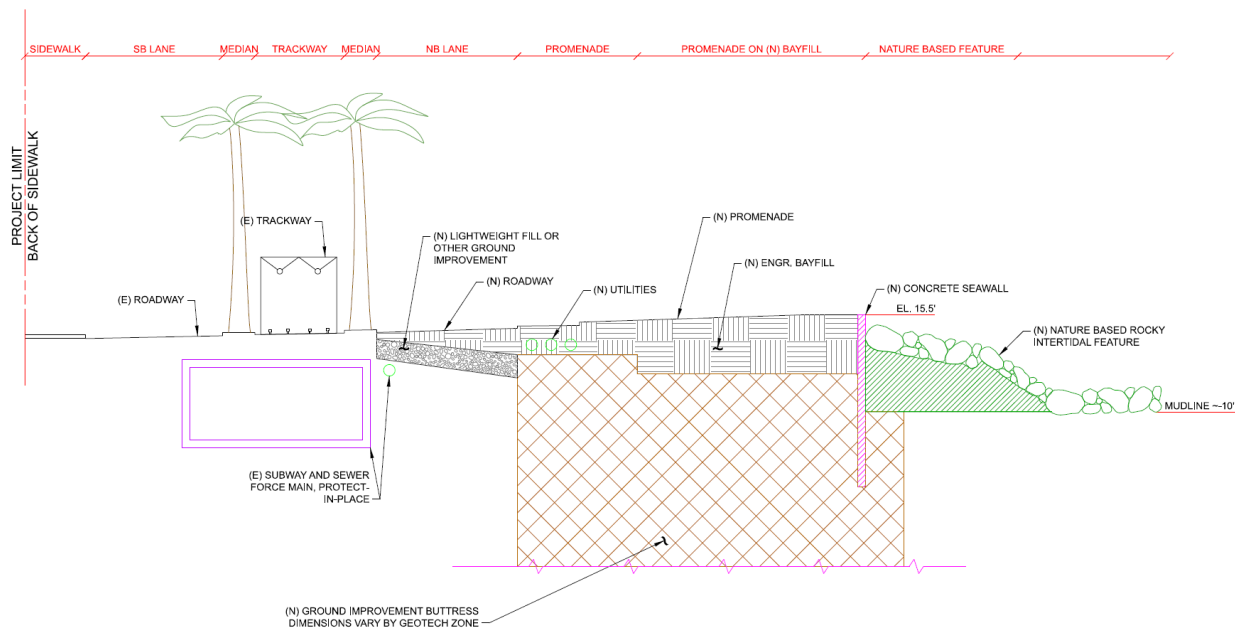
Section 3 Recommended Plan (Reach 2, Ferry Building)
